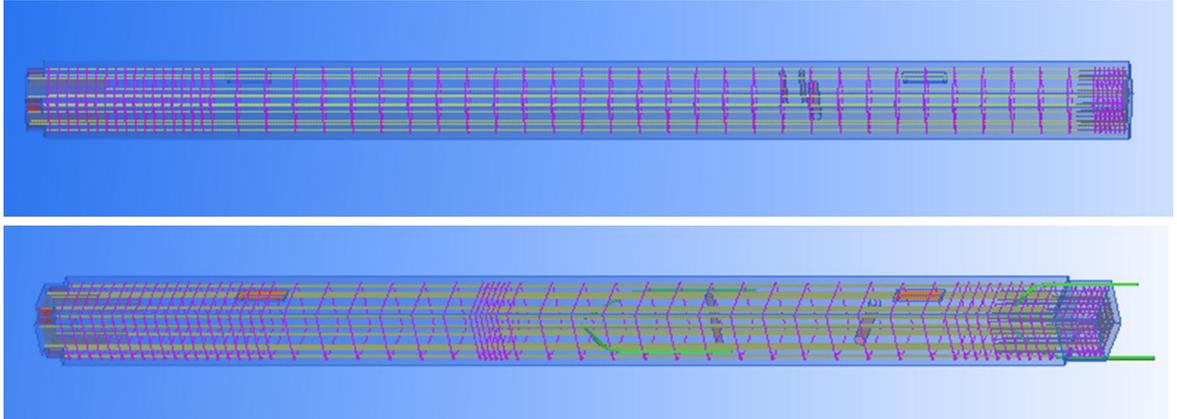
Column reinforcement modeled with a component (above) and without a component (below).
